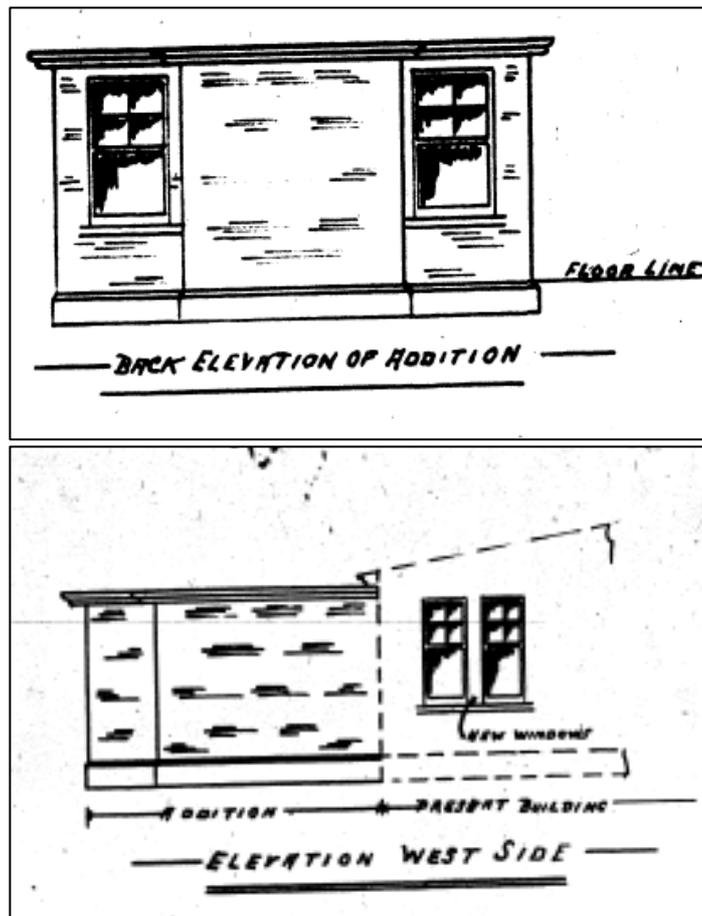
1940 Phase 3 addition. Top: west elevation (Room 17 left side and Room 18 right side). Bottom: north elevation (Building Plans, DCC Archives).
